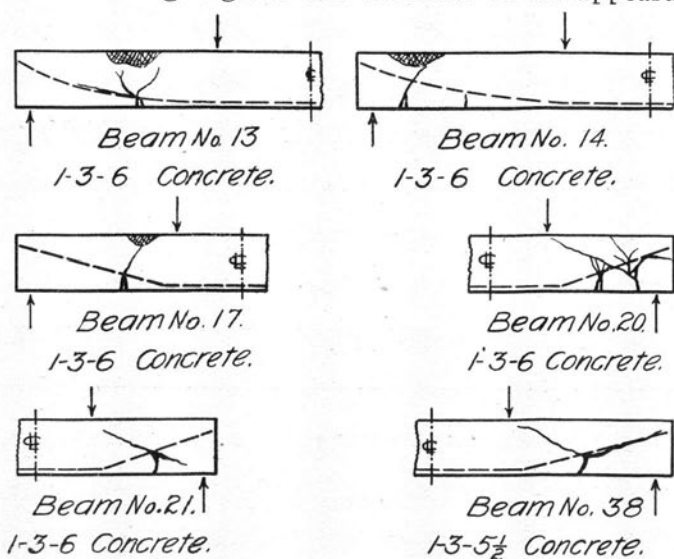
SKETCHES SHOWING BEAMS AFTER FAILURE.
